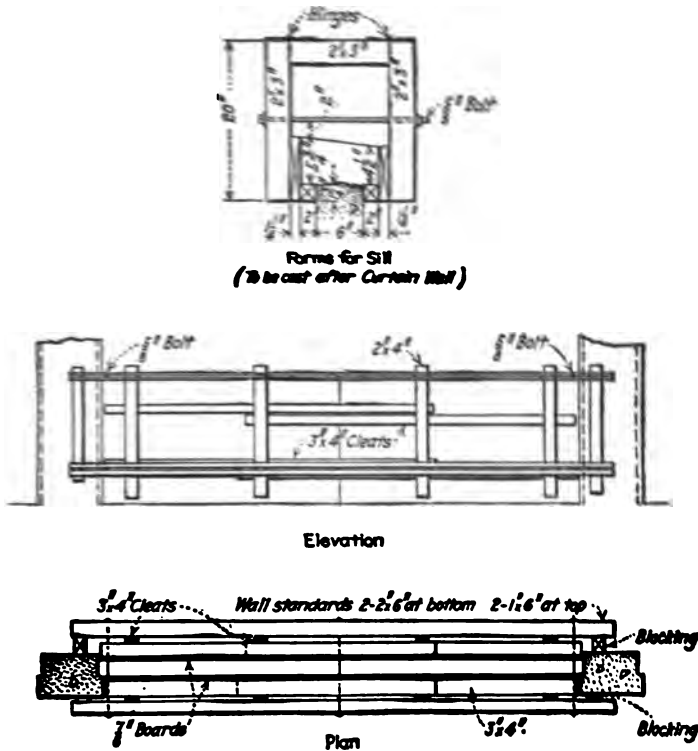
Forms for curtain wall and sill, American Hide and Leather Co.'s building, Lowell, Mass.
